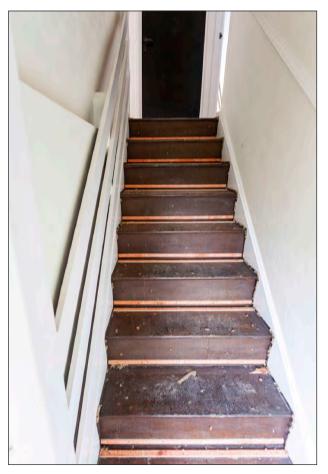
The Farmhouse: stairs to the first floor (main rang
